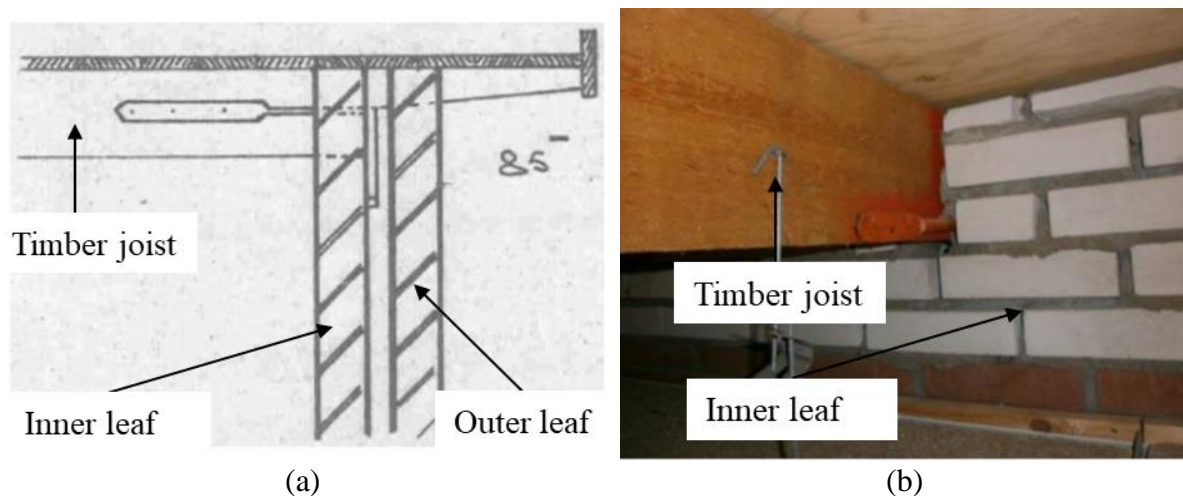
Connection example in a typical Dutch house: Elevation view of a cavity wall with a timber joist (a) and timber joist seated in a pocket located in the inner leaf of a cavity wall (b) [69].
